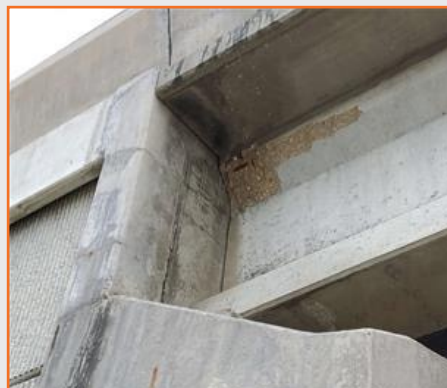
SRT bridge beam with exposed reinforcement at Ohio Dr.
